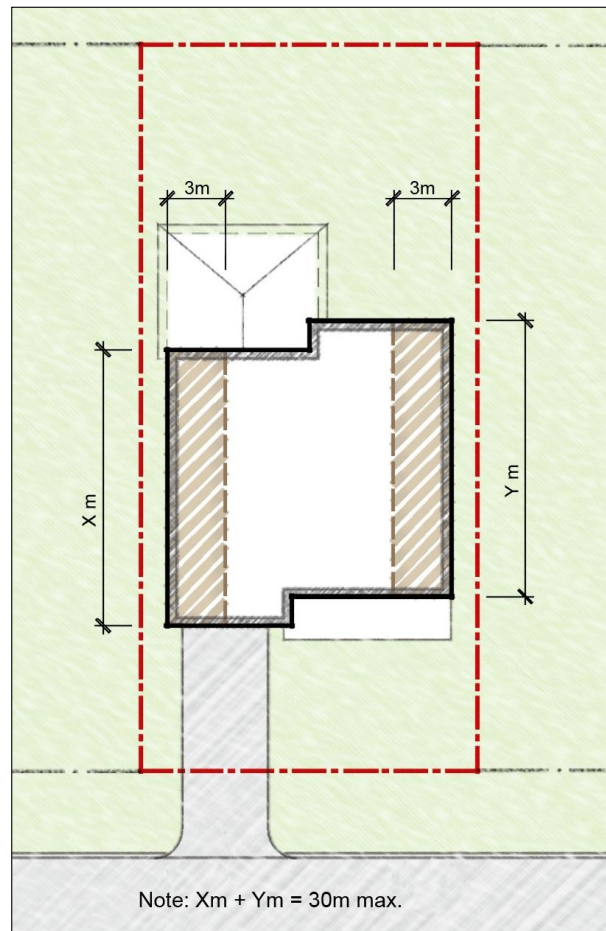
Maximum total first floor wall length of a two storey dwelling
